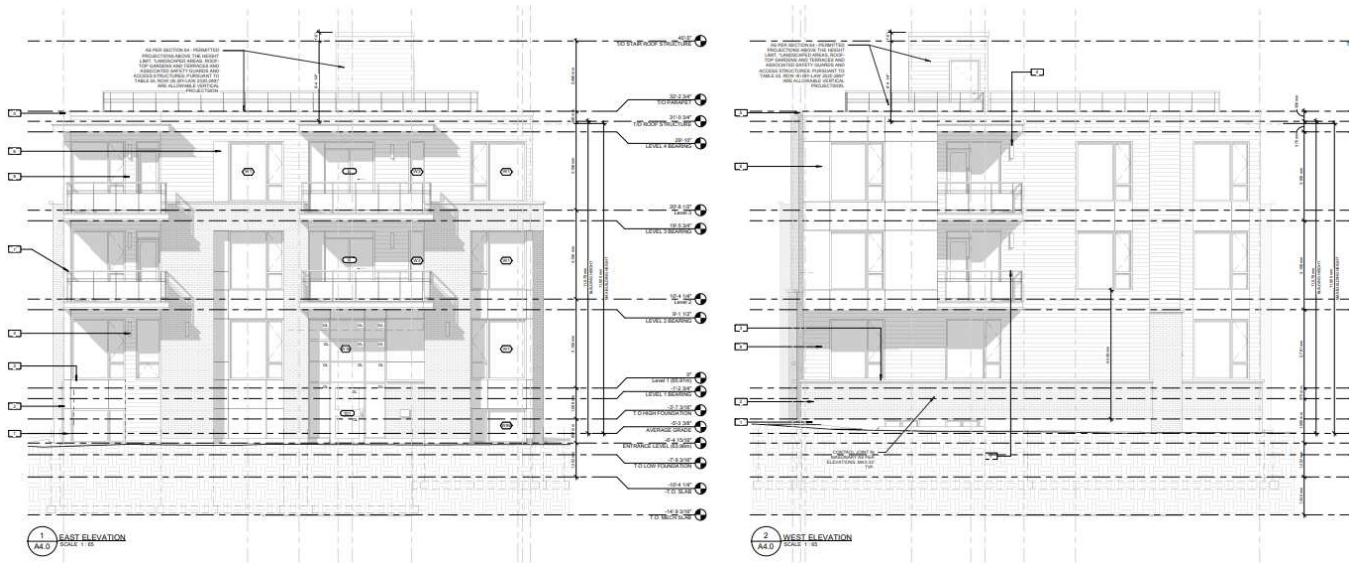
East (left) and west (right) building elevations showing the proposed balconies within the development.
